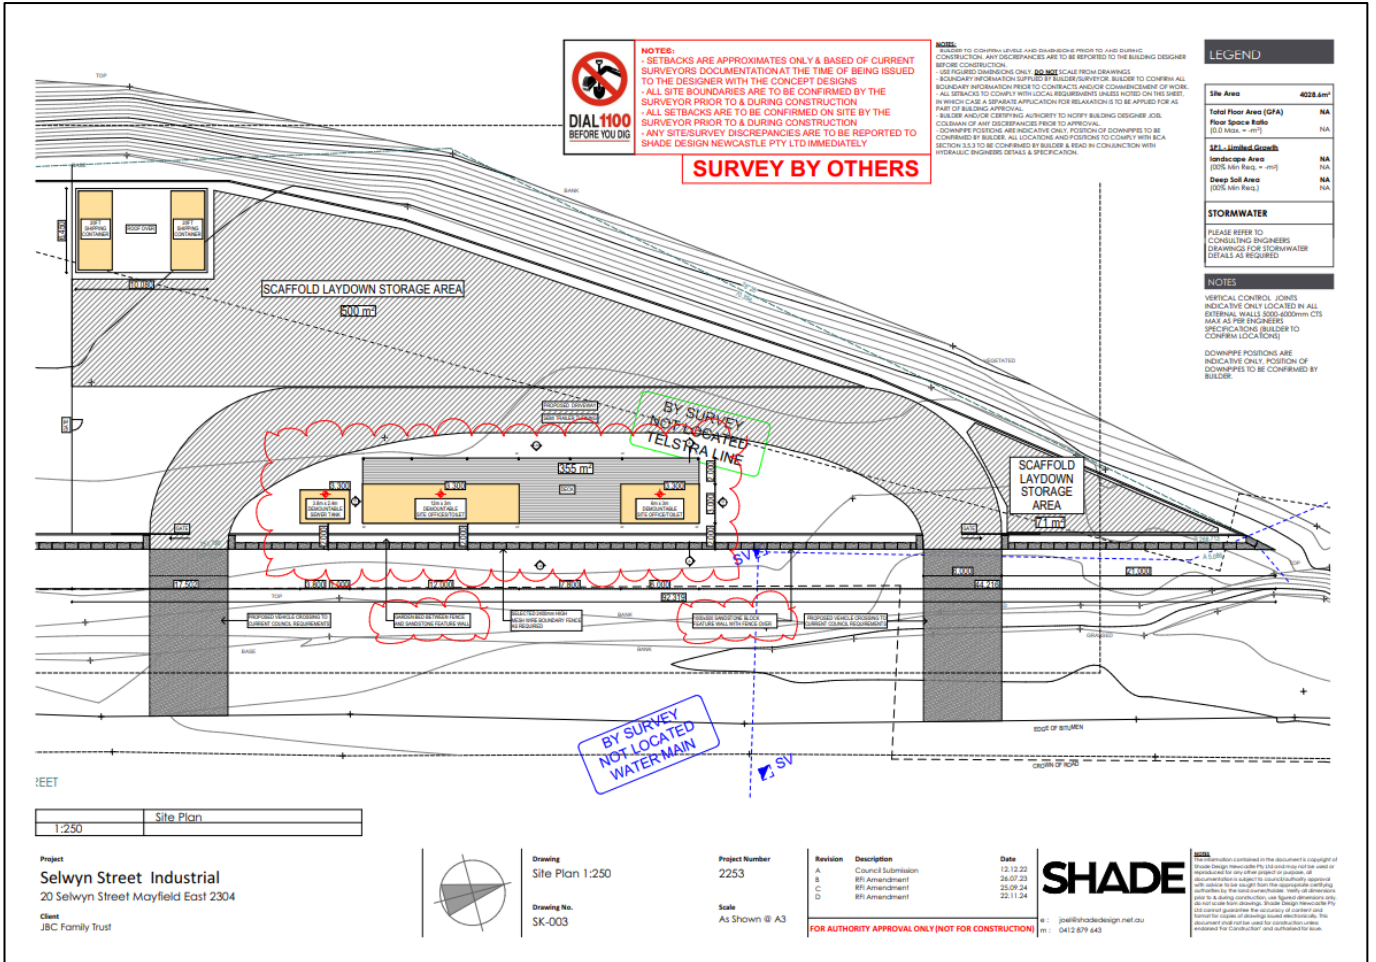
| Project site plan (Source: Statement of Environmental Effects, 2024)
